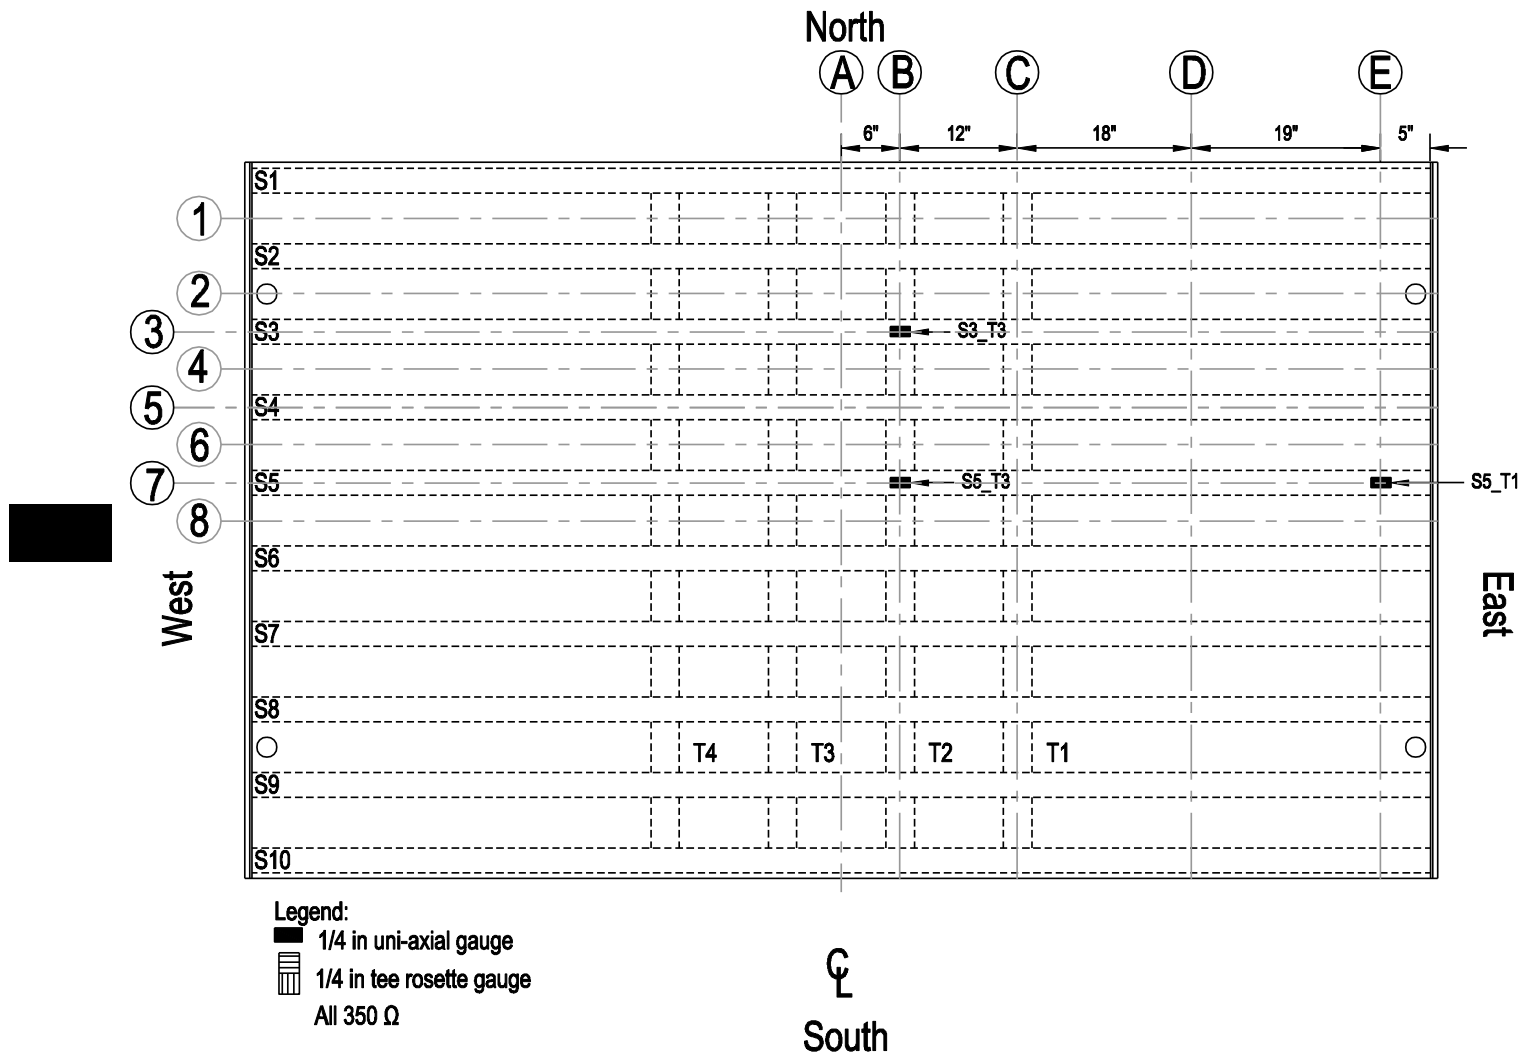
Strain gauge layout for Specimen #2 on top of deck plate
